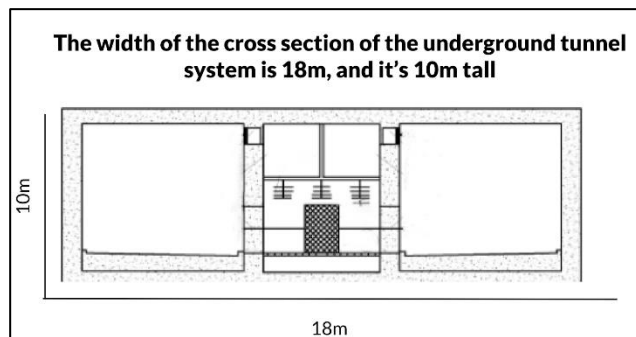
Diagram of a cross section of the underground tunnel system (Bergsma 1970)
